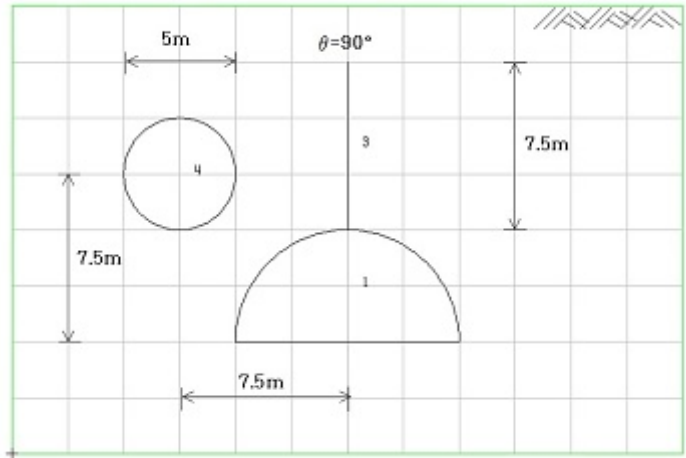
Arch tunnel with utility tunnel (Part 3)
